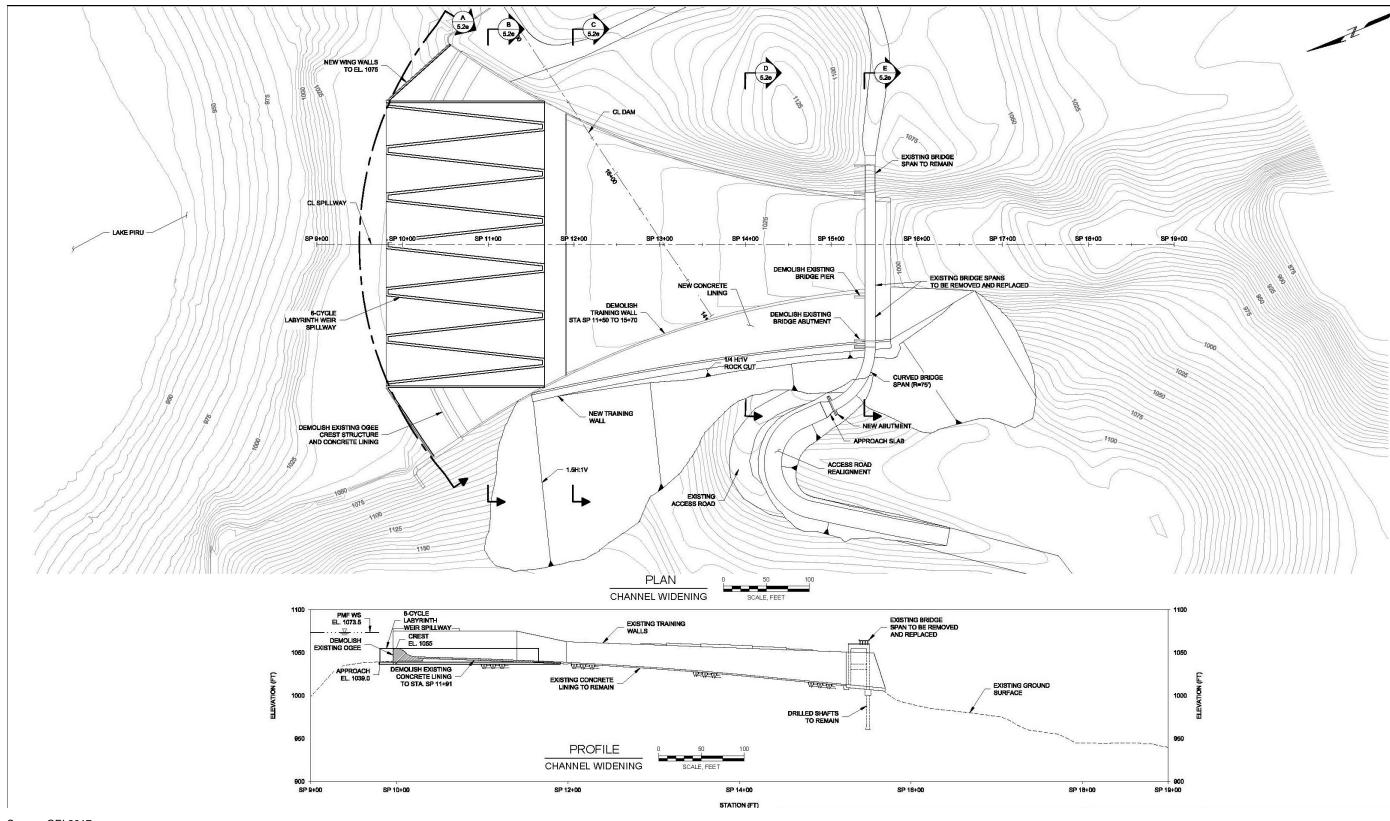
Labyrinth Weir Spillway and Spillway Widening Option Plan and Profile
